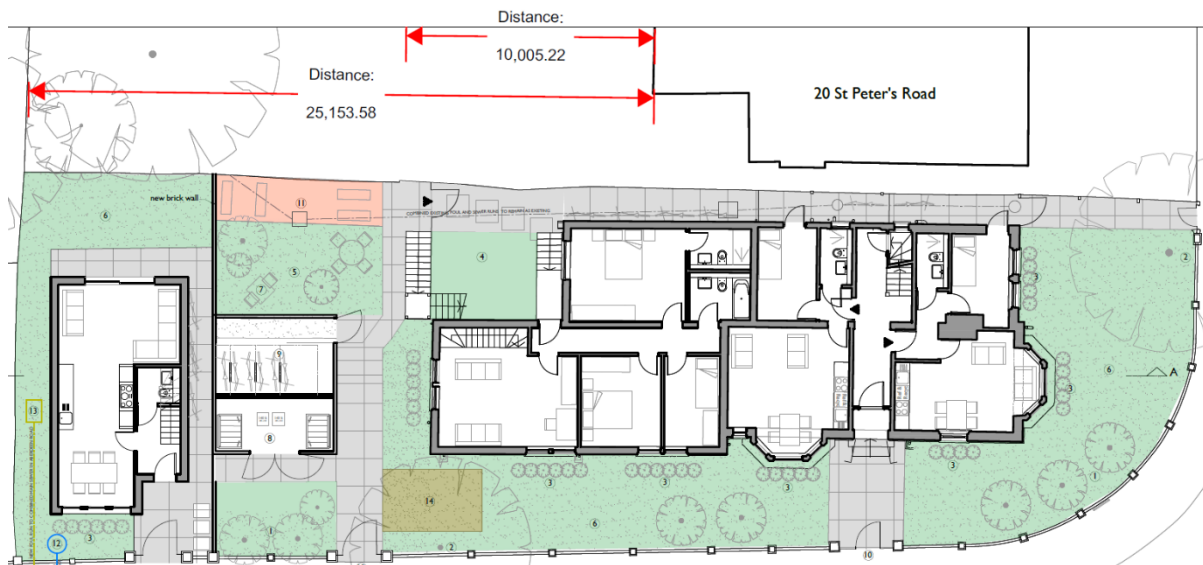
Proposed floor plan of the development and No. 20 St Peter's Road
